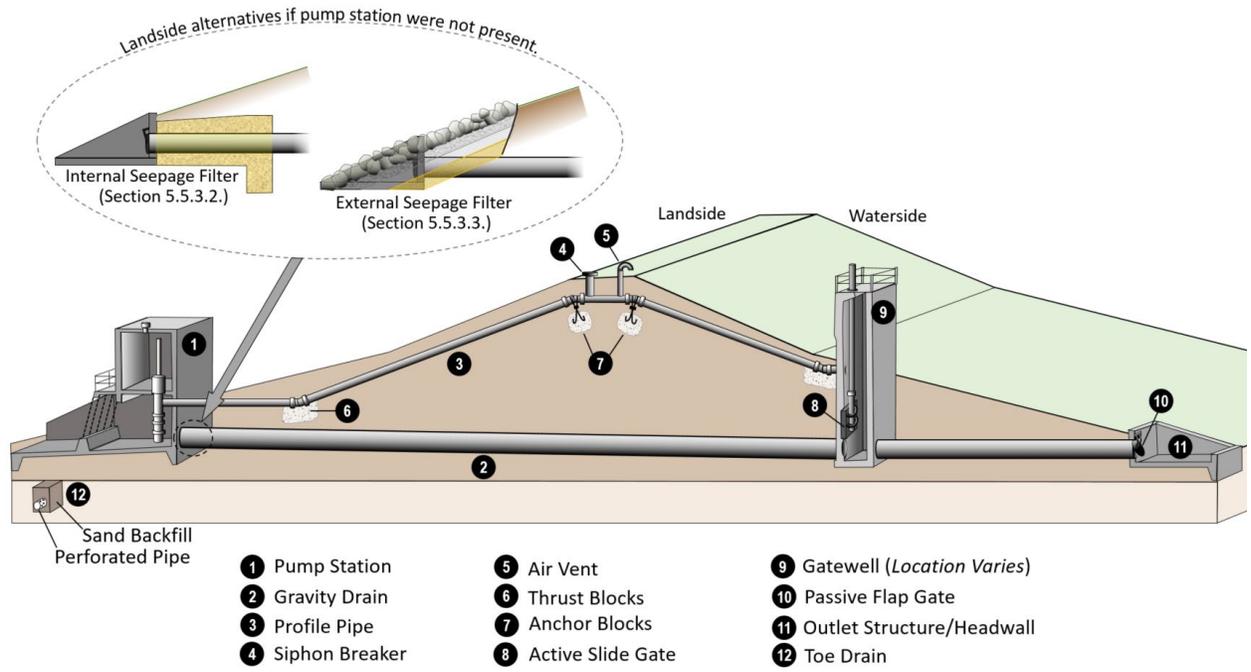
Typical associated structures and appurtenances common to pipes through levees.
